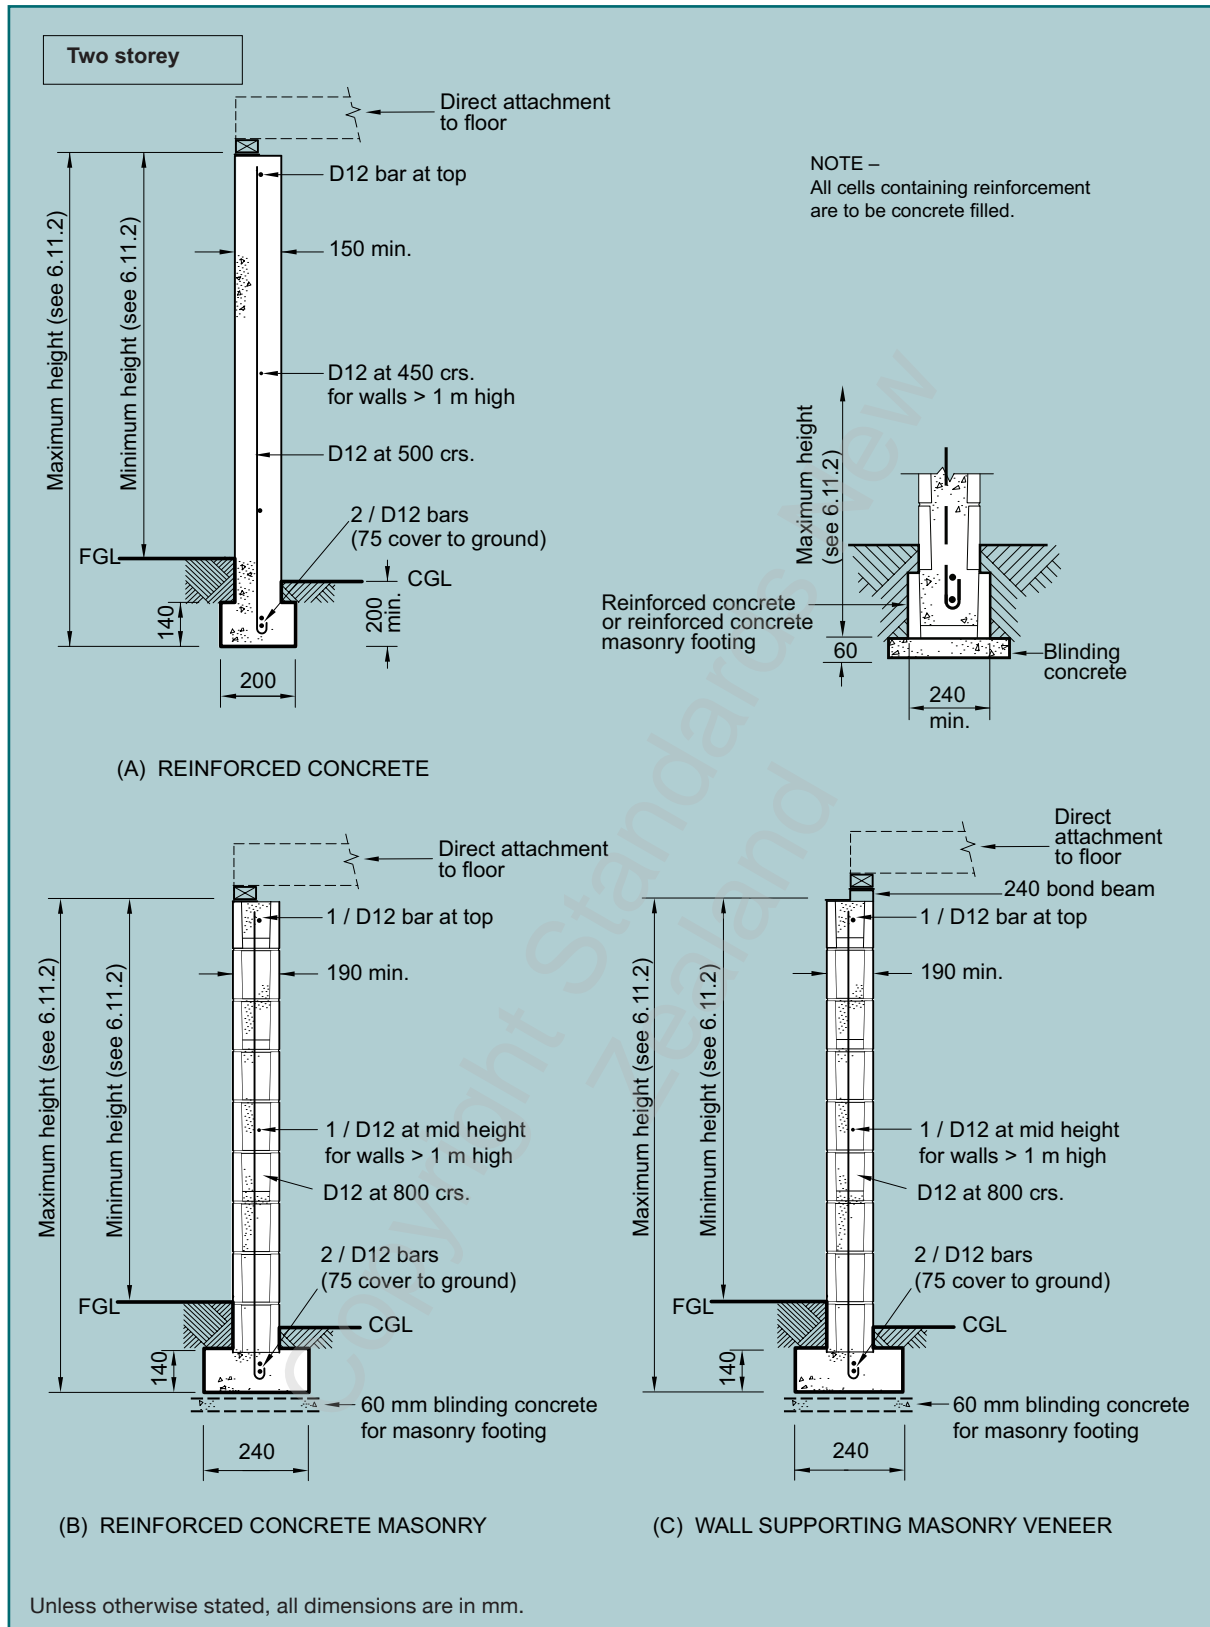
Foundation walls (not cantilevered) for two-storey buildings (see 6.11.3, 6.11.4.2, and 6.11.7.1)
